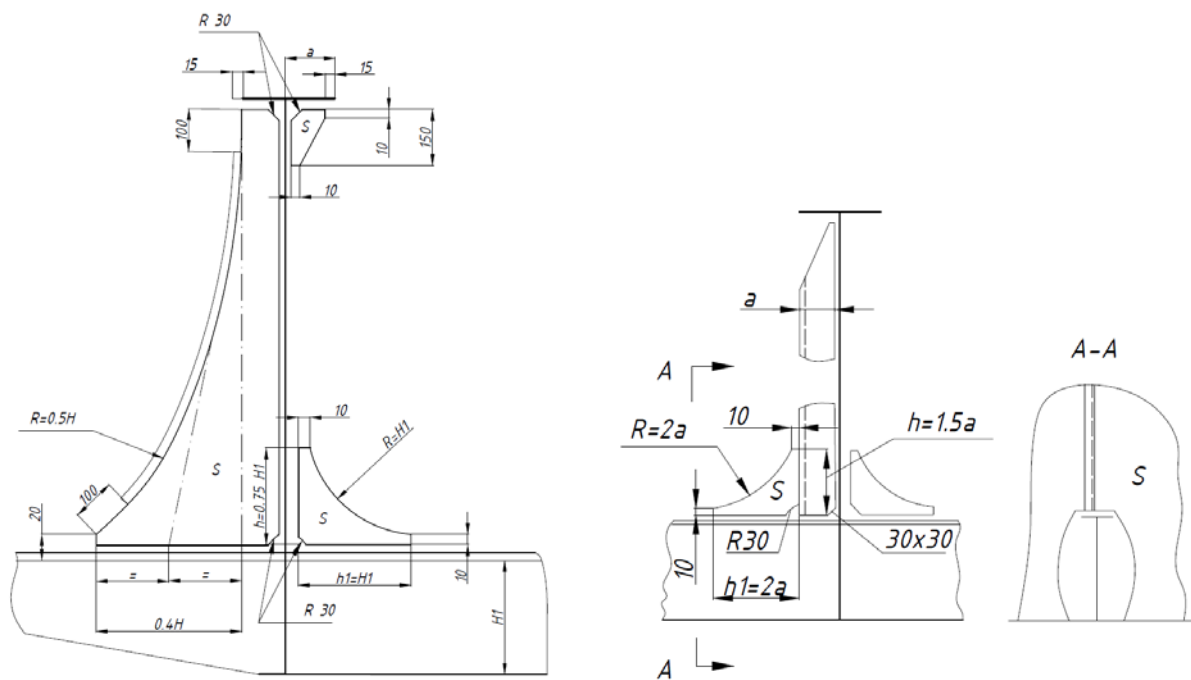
Solutions with additional elements in the girder passageway assembly [5]
